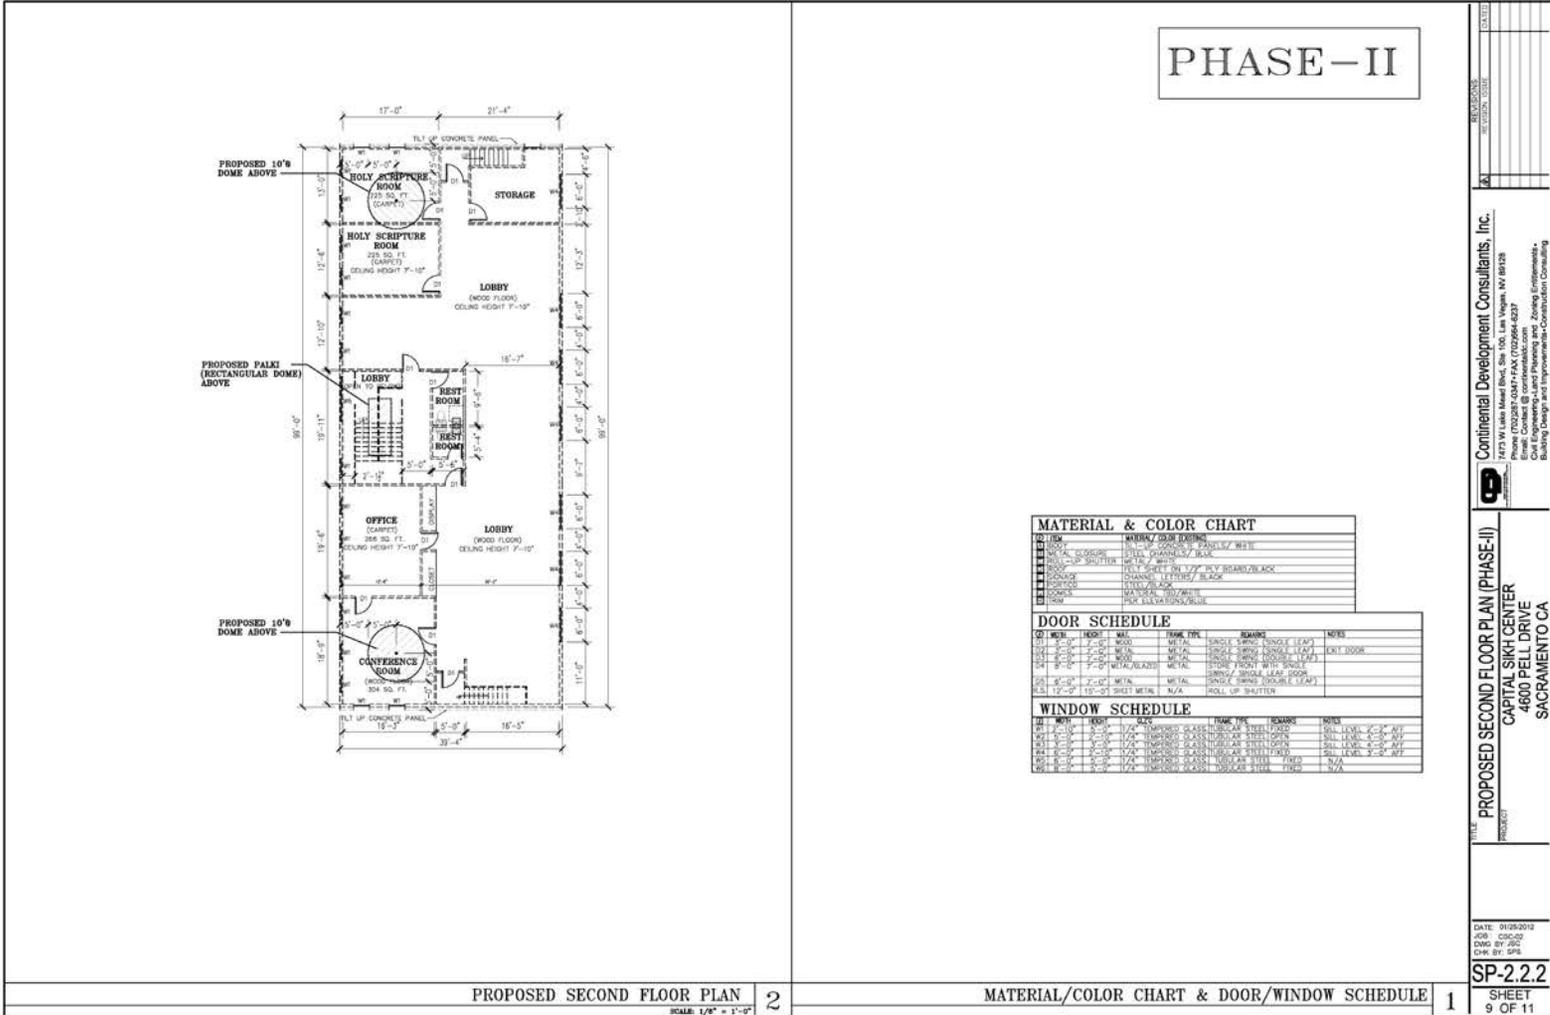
Proposed Second Floor Plan (Phase 2)
